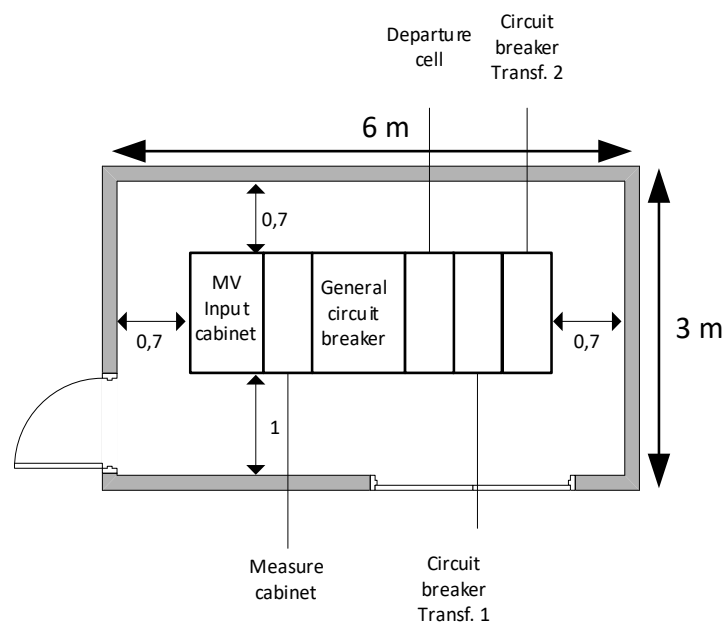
Required medium voltage room layout - Patwardhan 2 depot
